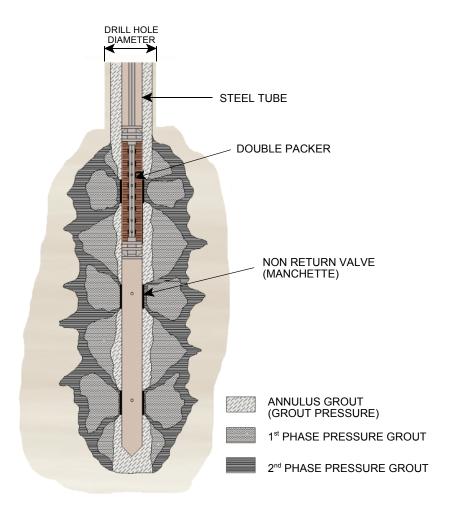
7. Use of Reinforcement Tube as a Tube á Manchette Postgrouting System
